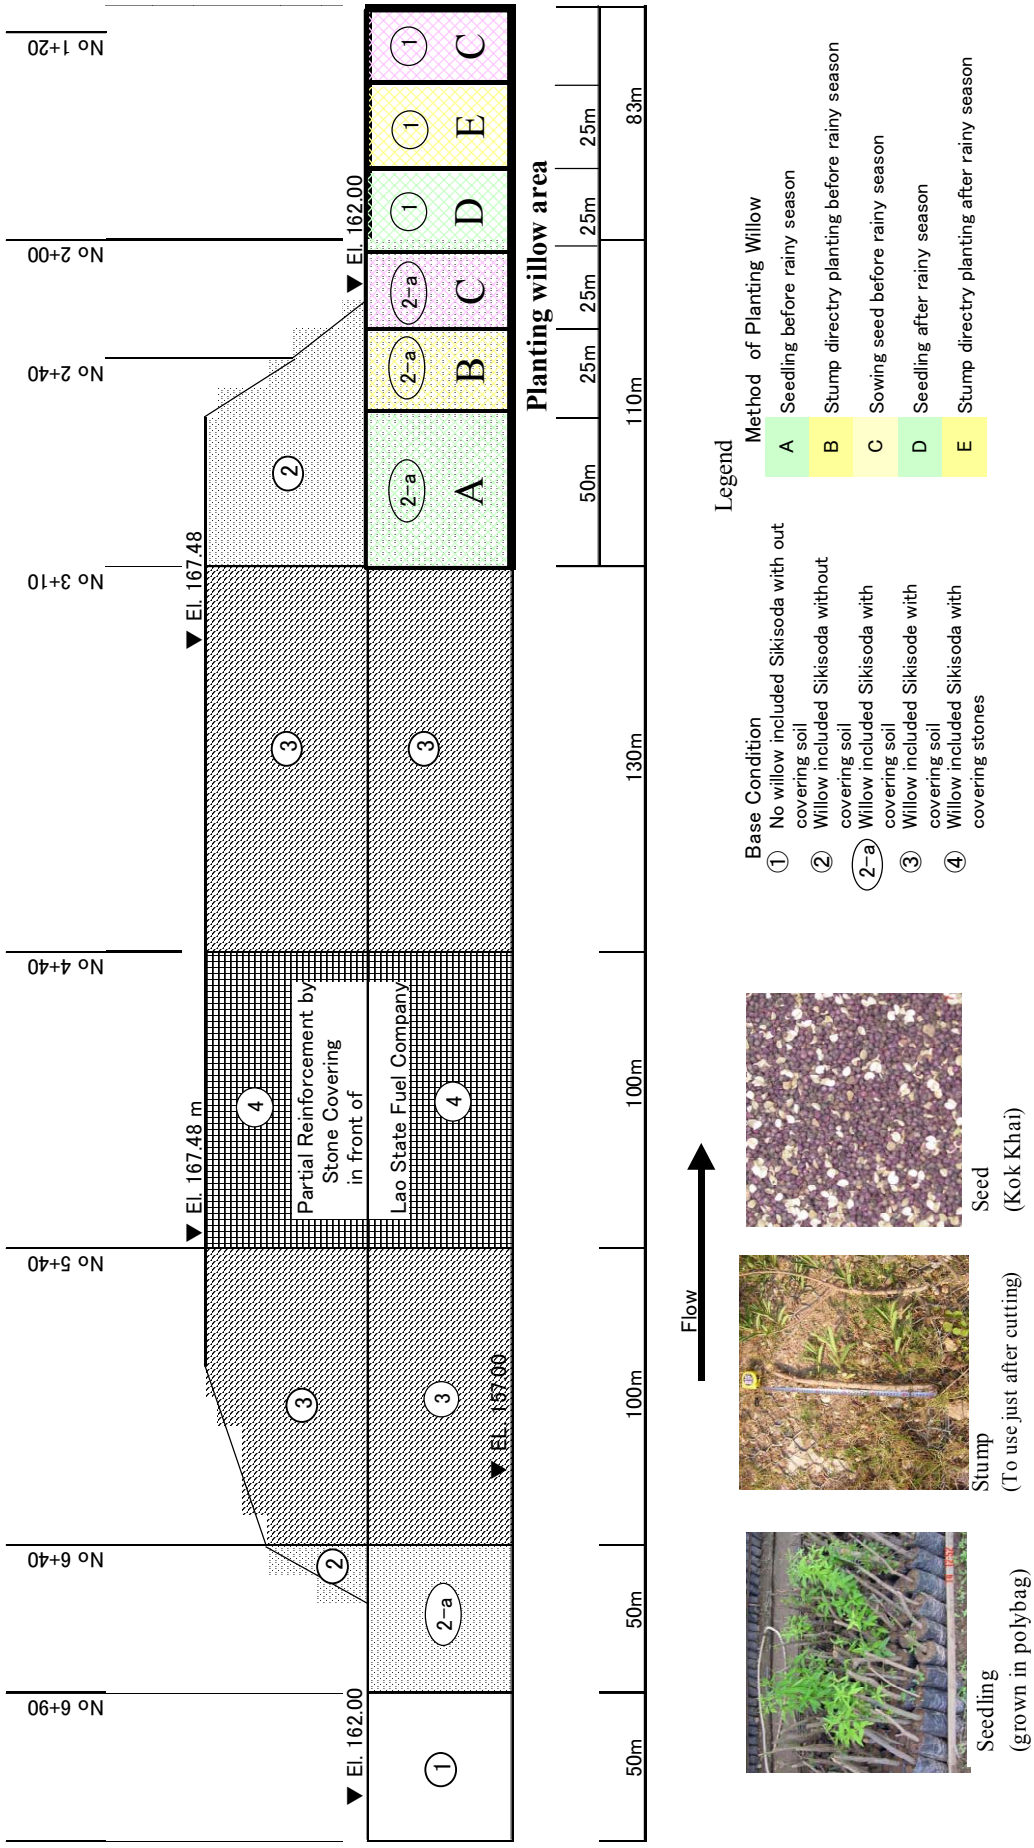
Willow Planting Design at Ban Dongphosi Site
